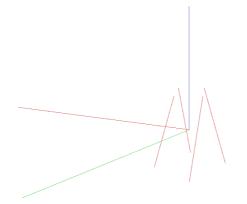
Refined Strut and Tie Layout for Four Piles Pile Cap (Span/Depth=1)
